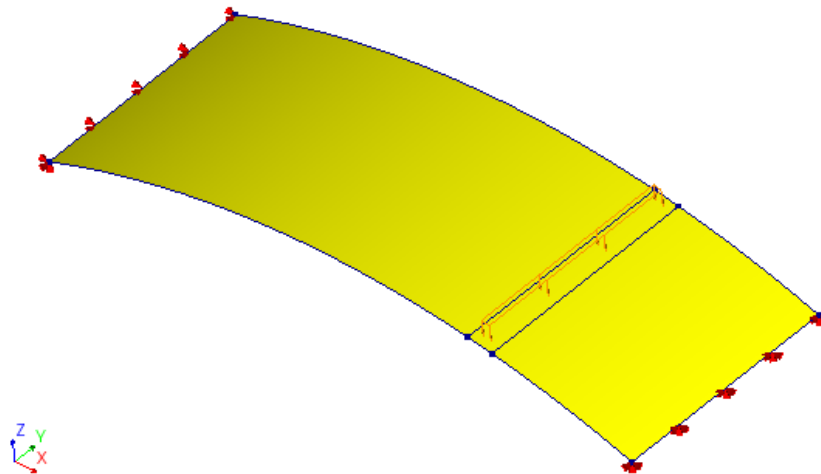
Loads and supports in the 3D shell model of Tile vault and Composite Timbrel – Concrete vault.
